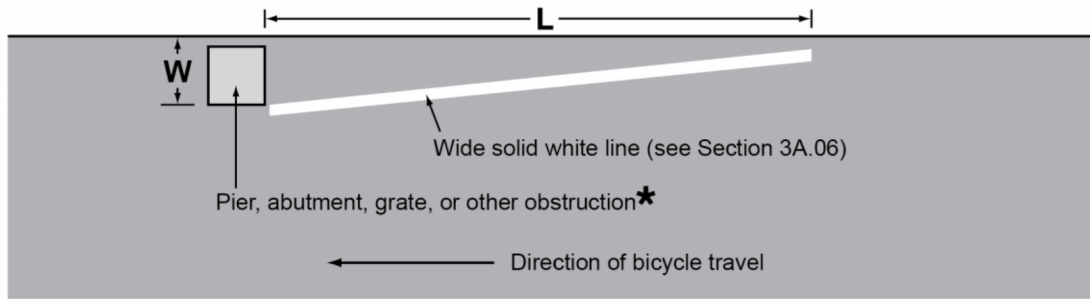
C-8. Examples of Obstruction Pavement Markings
